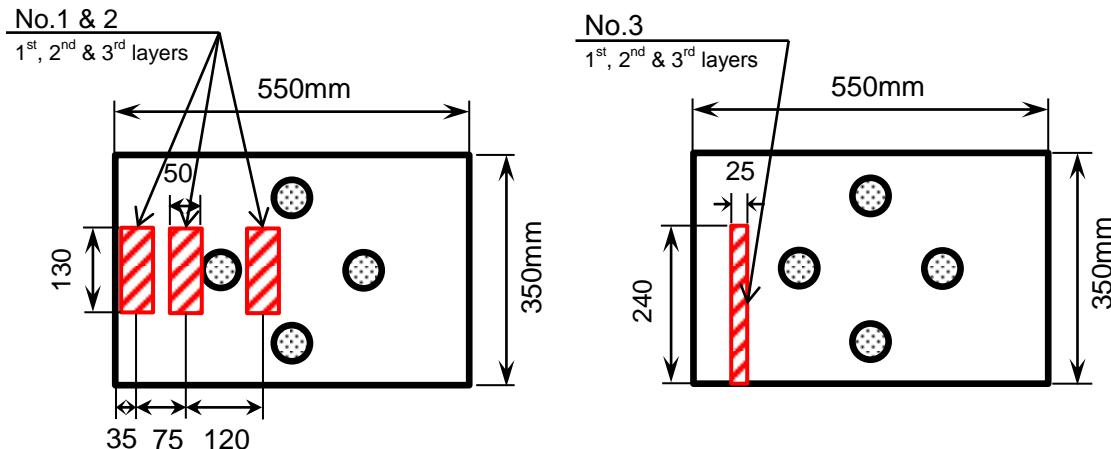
Sampling locations of specimens (from aging deteriorated bearing)
